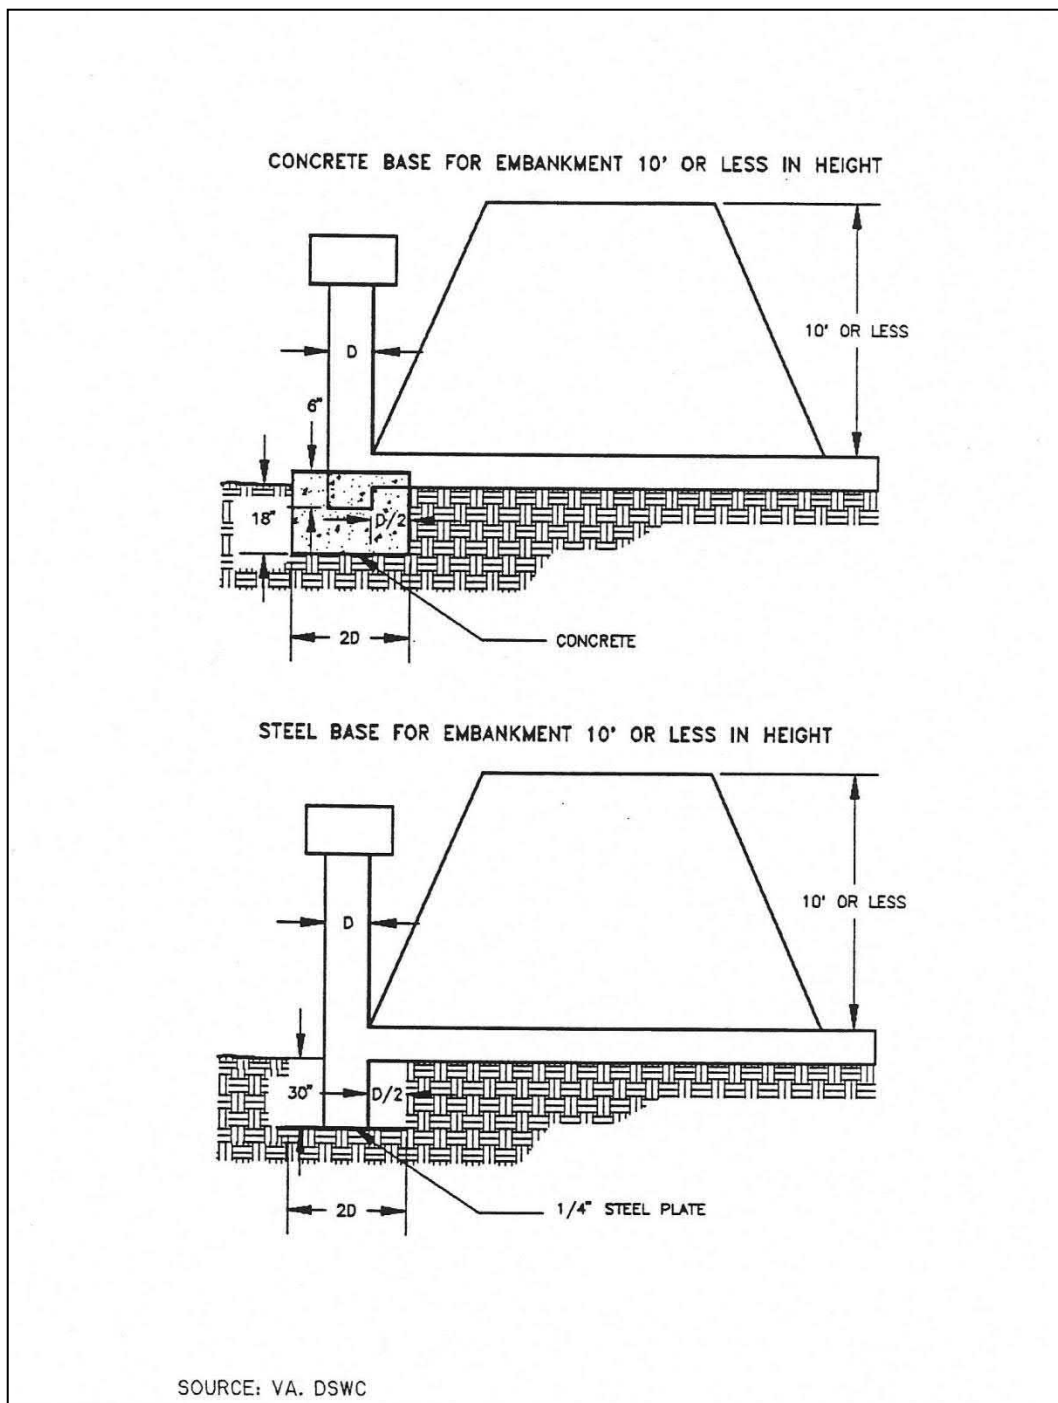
Riser Pipe Base Design for Embankment Less Than 10 Feet High
